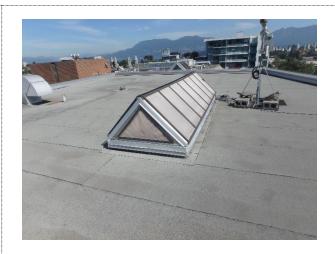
One standalone skylight is located at the center of the main roof.
